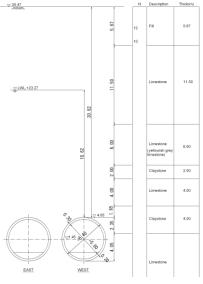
Tunnel through the Lime Stone Section 17k960m [1]
